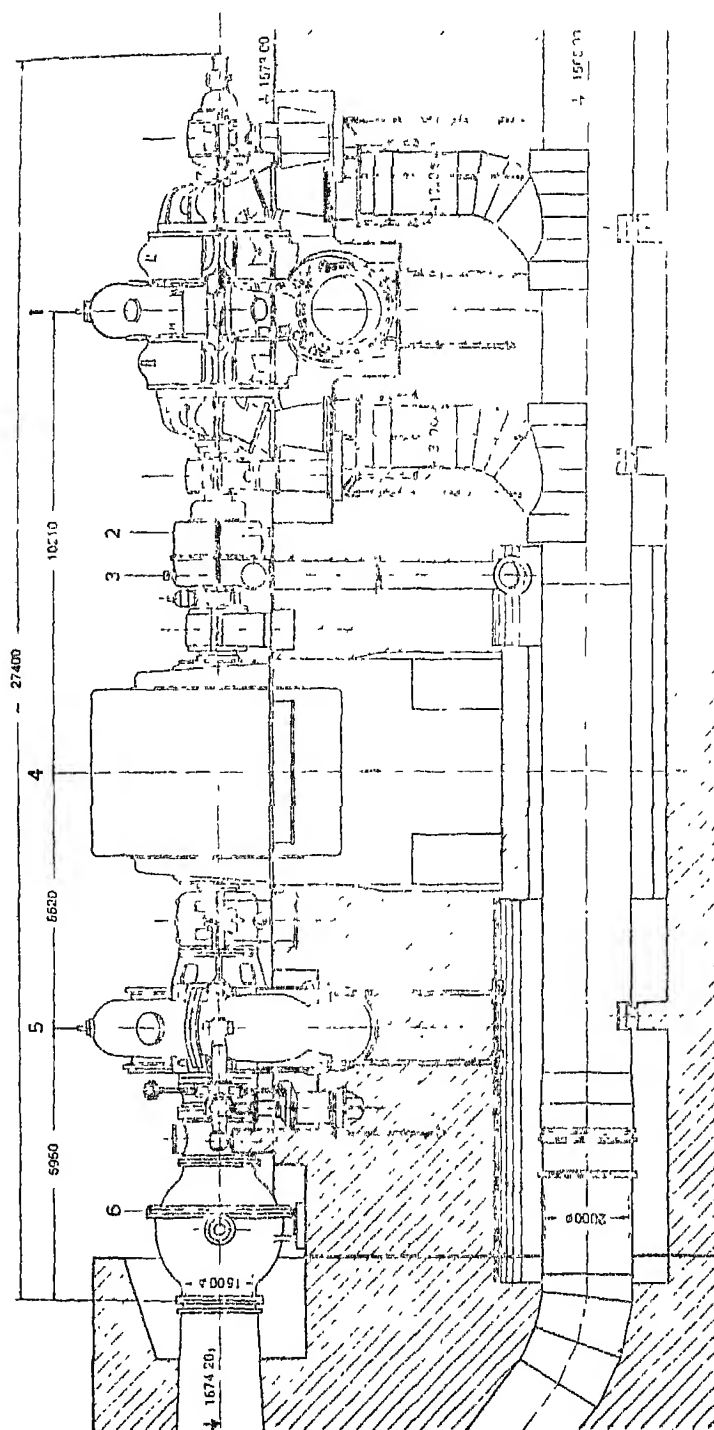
Horizontal Arrangement of Pumped Storage Plant
